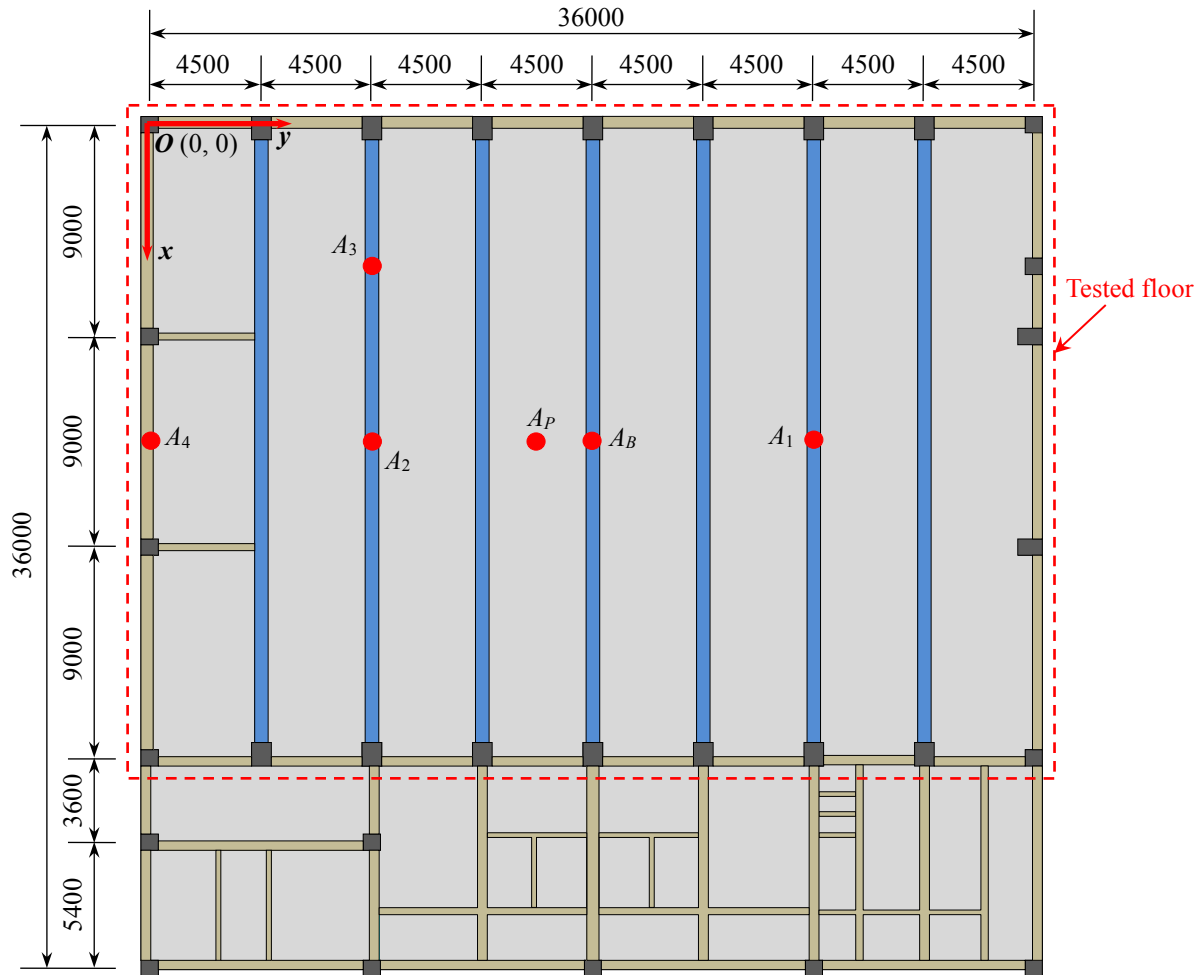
Outline of prestressed concrete floor #1 (all dimensions in mm)
